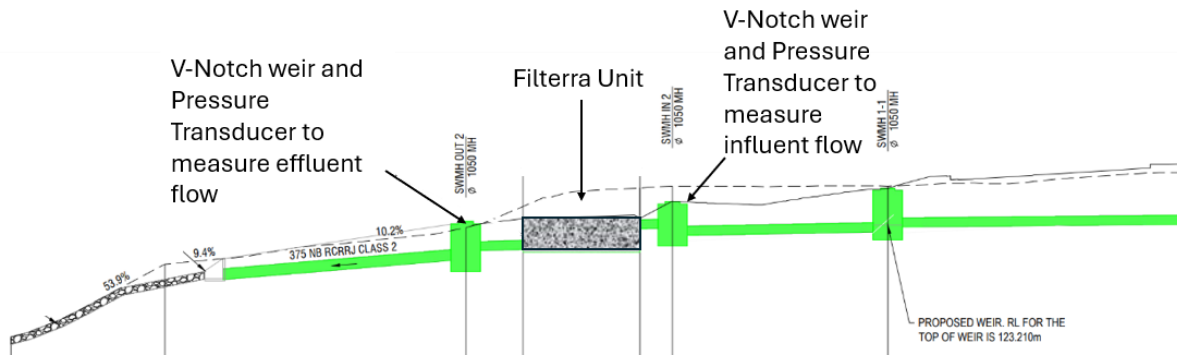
Longitudinal section illustrates the location of inlet and outlet V-notch weirs and pressure transducers.
